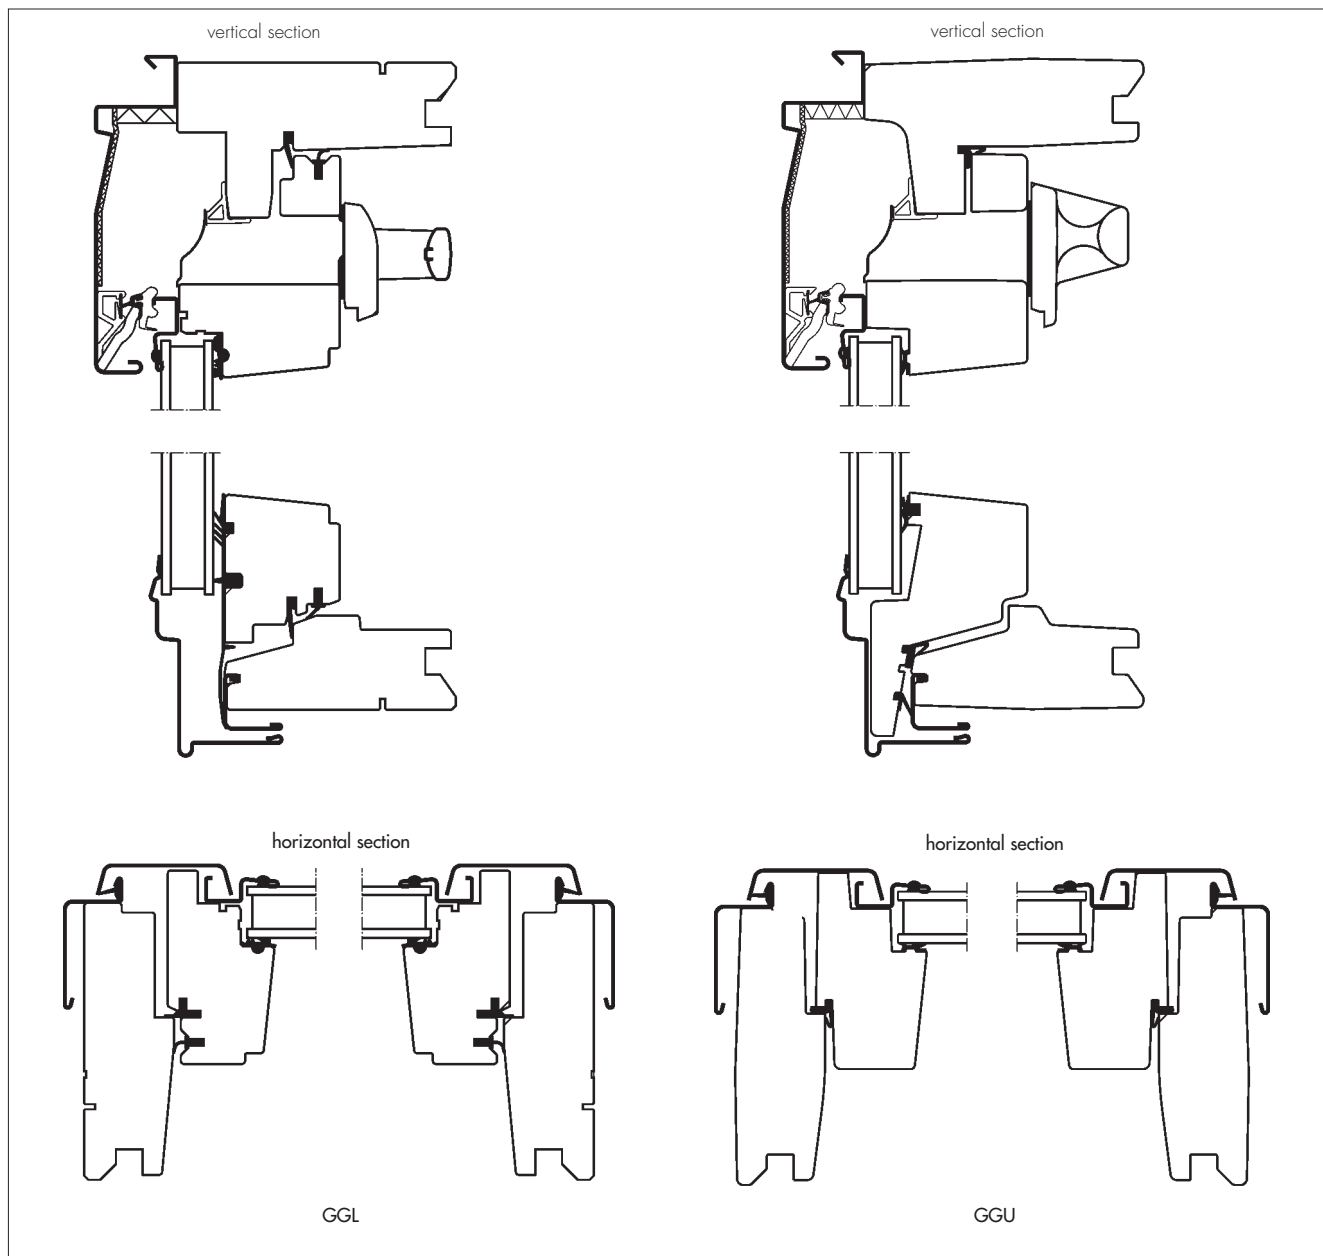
VELUX GGL and GGU Centre Pivot Roof Windows
